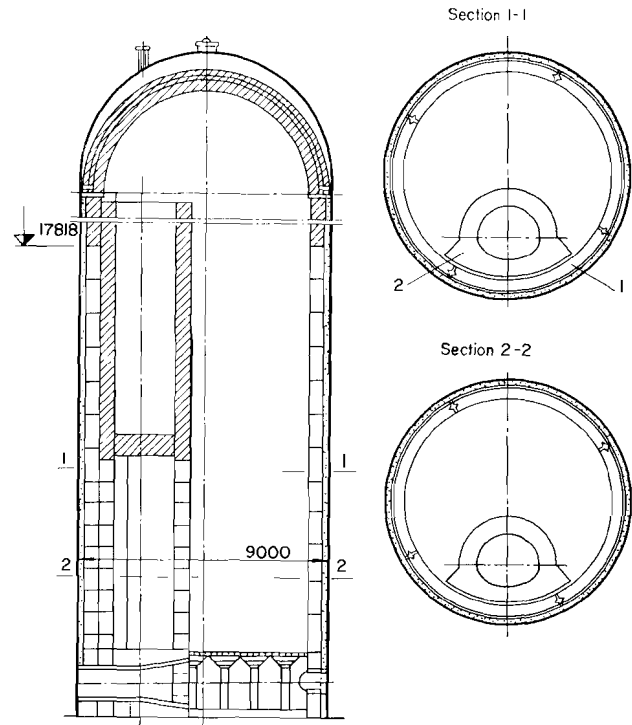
Refractory lining of air preheater walls made of large fire-proof concrete blocks. Temperature up to 1200 °C.
